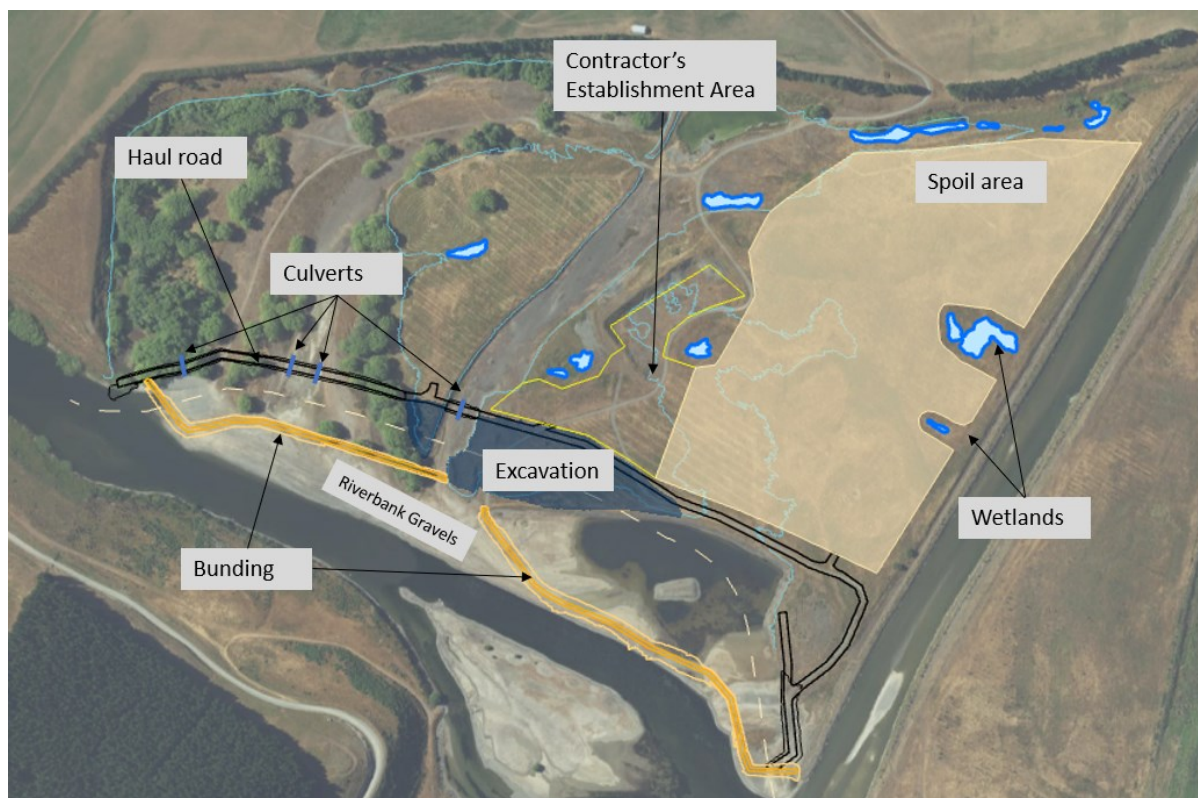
Stage 1 – contractor's establishment area (yellow outline), spoil disposal area setup, haul road (and culverts), river bunding (orange), and initial excavation (shown in partly transparent dark blue); RL 180.5 m contour (maximum lake level) shown in light blue.
